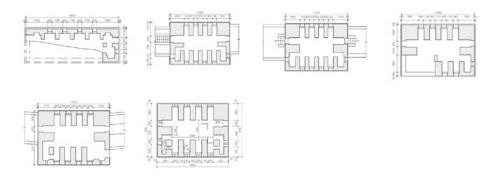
Typology 1-6: Floor Plan of No. 37, 40, 44, 47, 48, 53, 55
